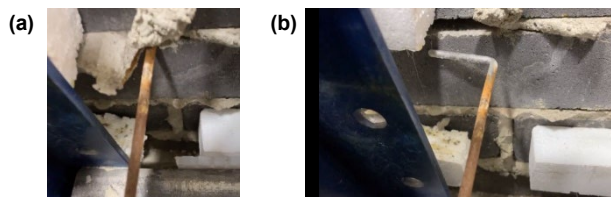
T-Z.CN-1 after testing (a) top view, (b) top view of removal of connector from veneer
